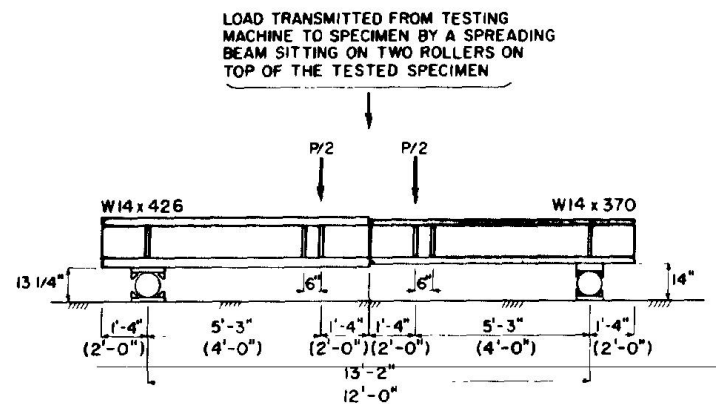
Specimen setup for full penetration test (partial penetration test specimen dimensions in parentheses).
